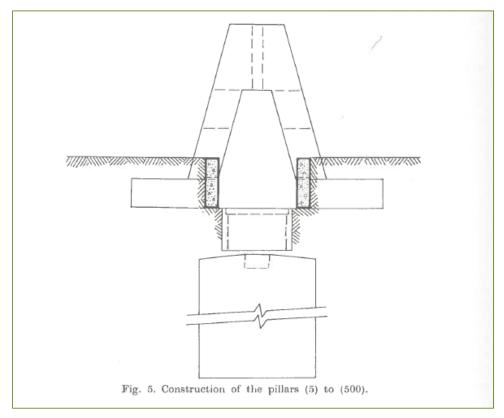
Construction detail drawing of 5-m and 500-m pillars (Kukkamäki 1968:20)
